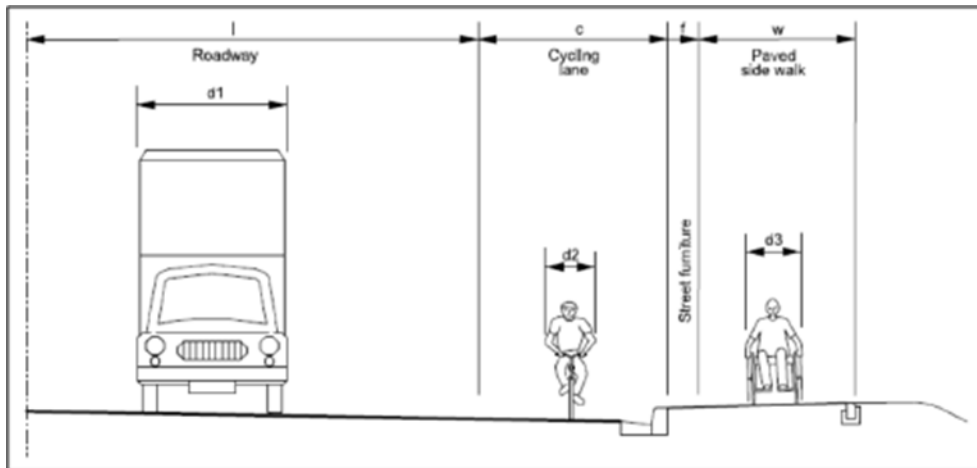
Typical cross-section of a complete street with a walkway/cycle track
